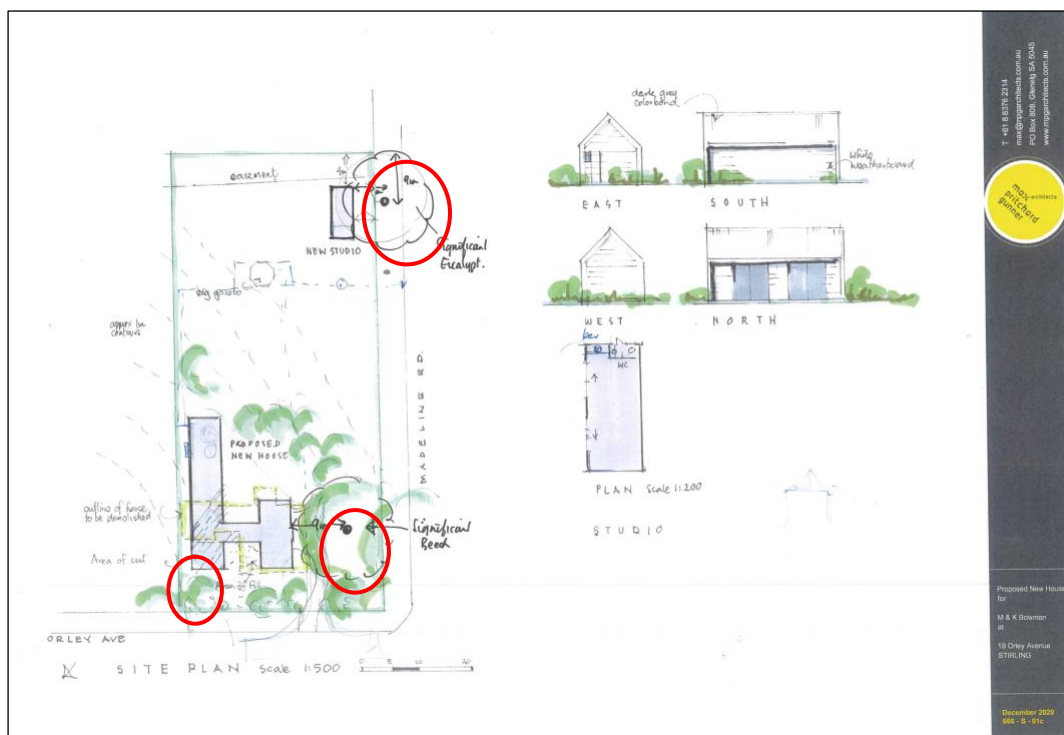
shows the proposed plans for 19 Orley Avenue, Stirling SA 5152
